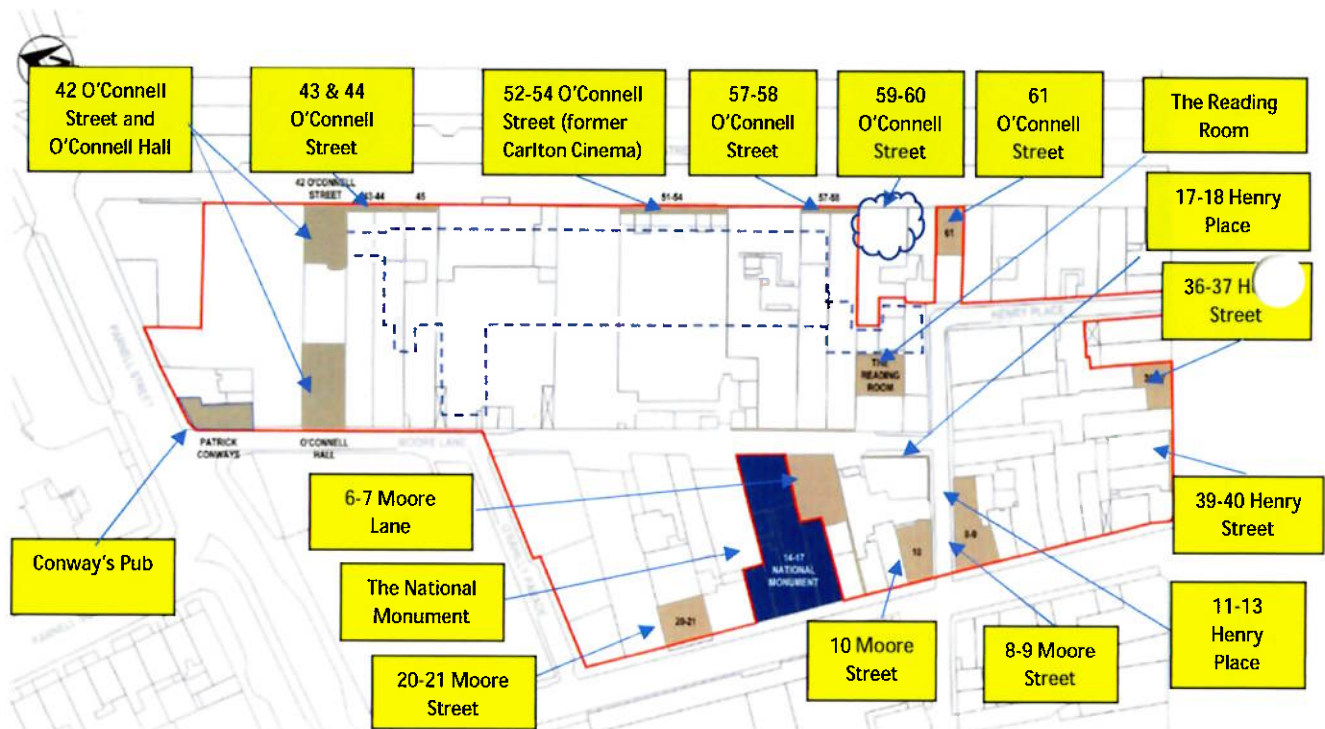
Protected Structures and non-protected structures proposed to be retained.
